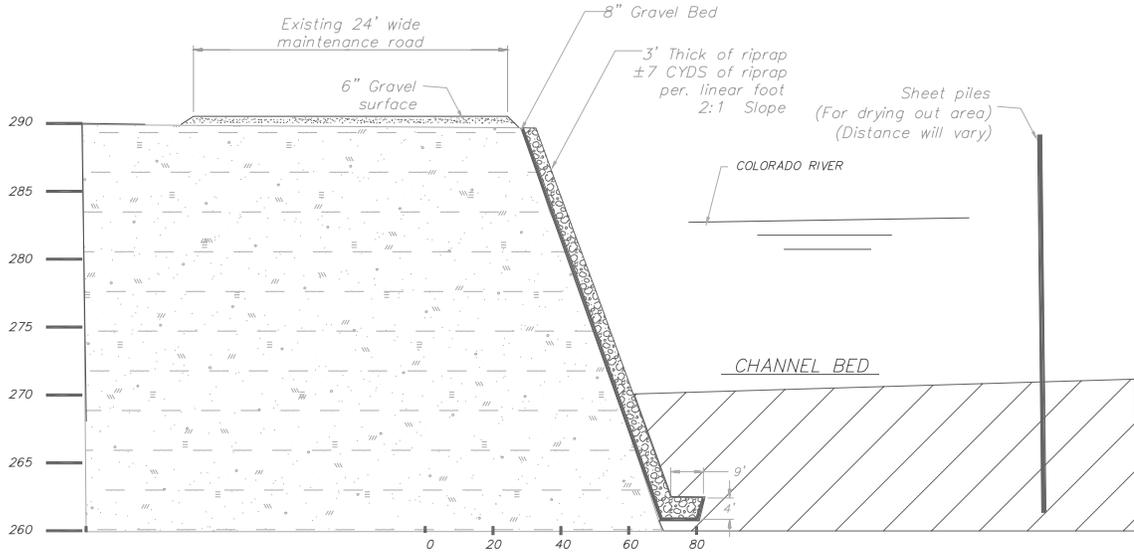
Typical Cross Section for Riprap Placement in Dry (Drwng # LB873OPT.DWG)
